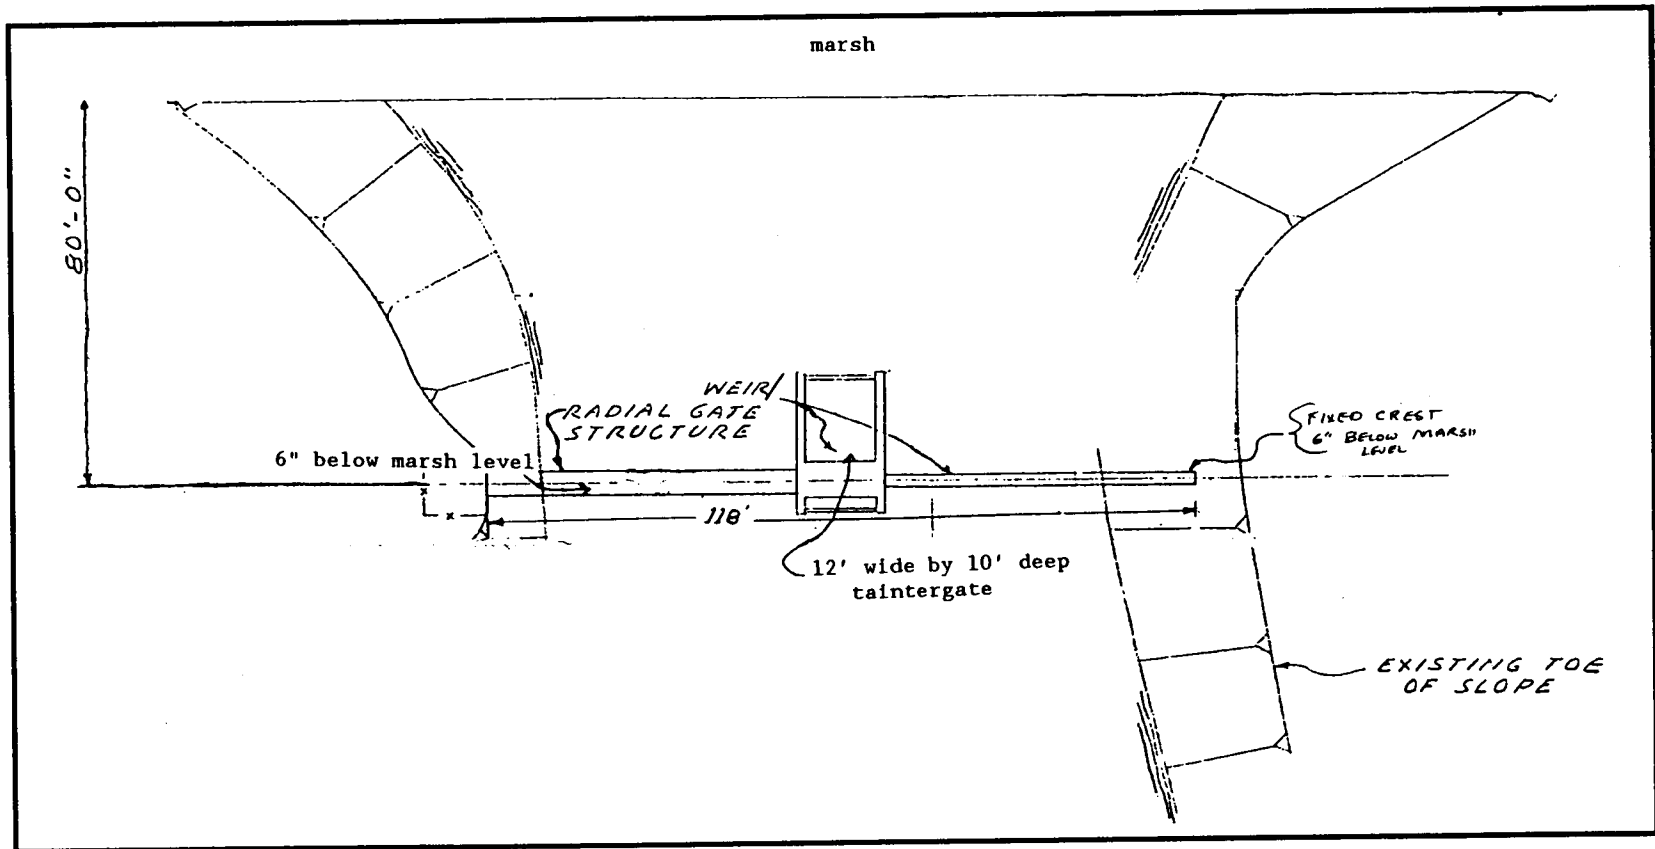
Plan view of Sabine Refuge cement (concrete) tainter gate: (ARMCO Steel Corp. 1980).
